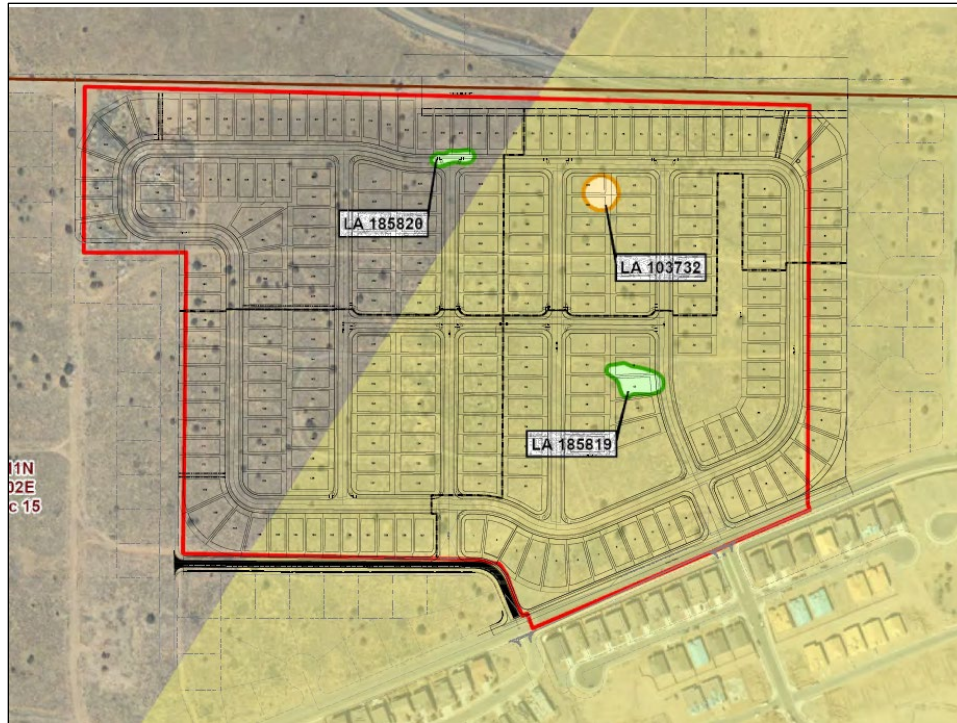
La Cuentista Subdivision Plan, site locations, and SR 1234
